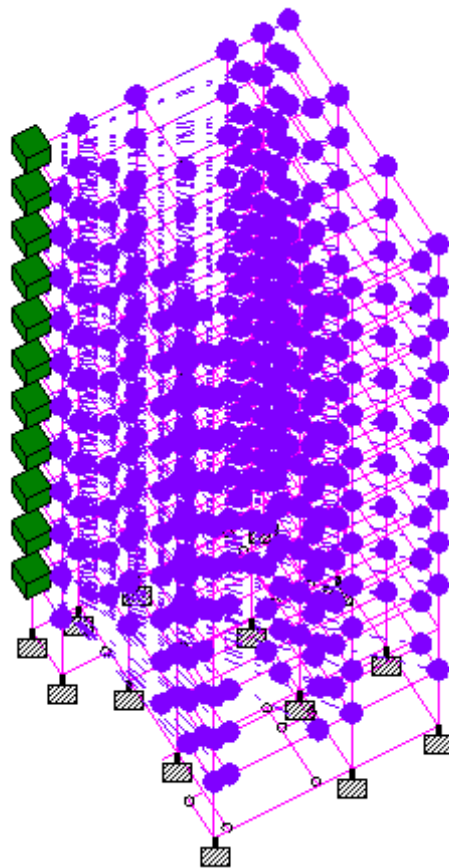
STAAD Model of Residential Building(with diaphragm) in isometric view
